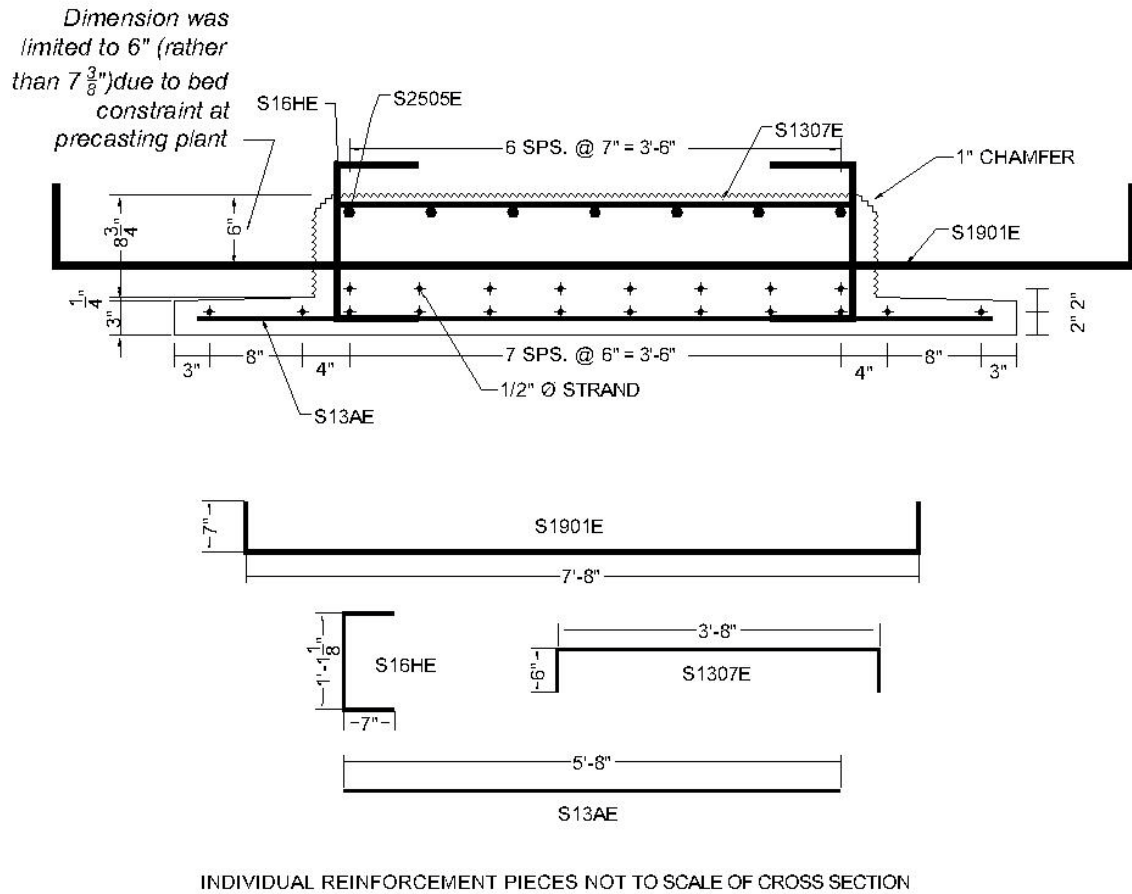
Cross section and individual reinforcement details for midspan of precast beam 1N
